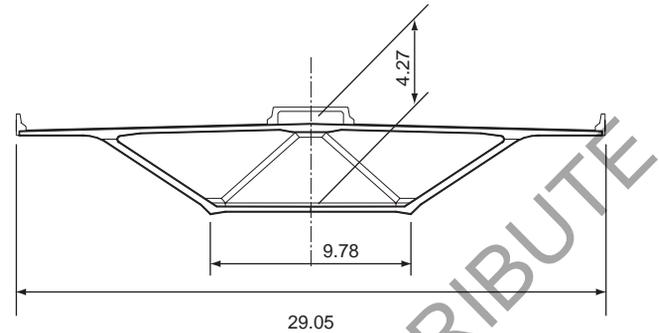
Concrete torsion box deck – Sunshine Skyway Bridge, USA (all dimensions in metres)
